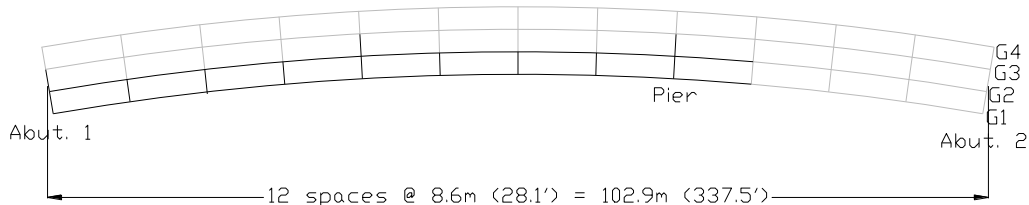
Stage 1 of Construction for Paired Girder (Inner Girders Placed First) Erection of Two Unequal Spans, 4-Girder, 305-m (1000-ft) Radius Bridge.
